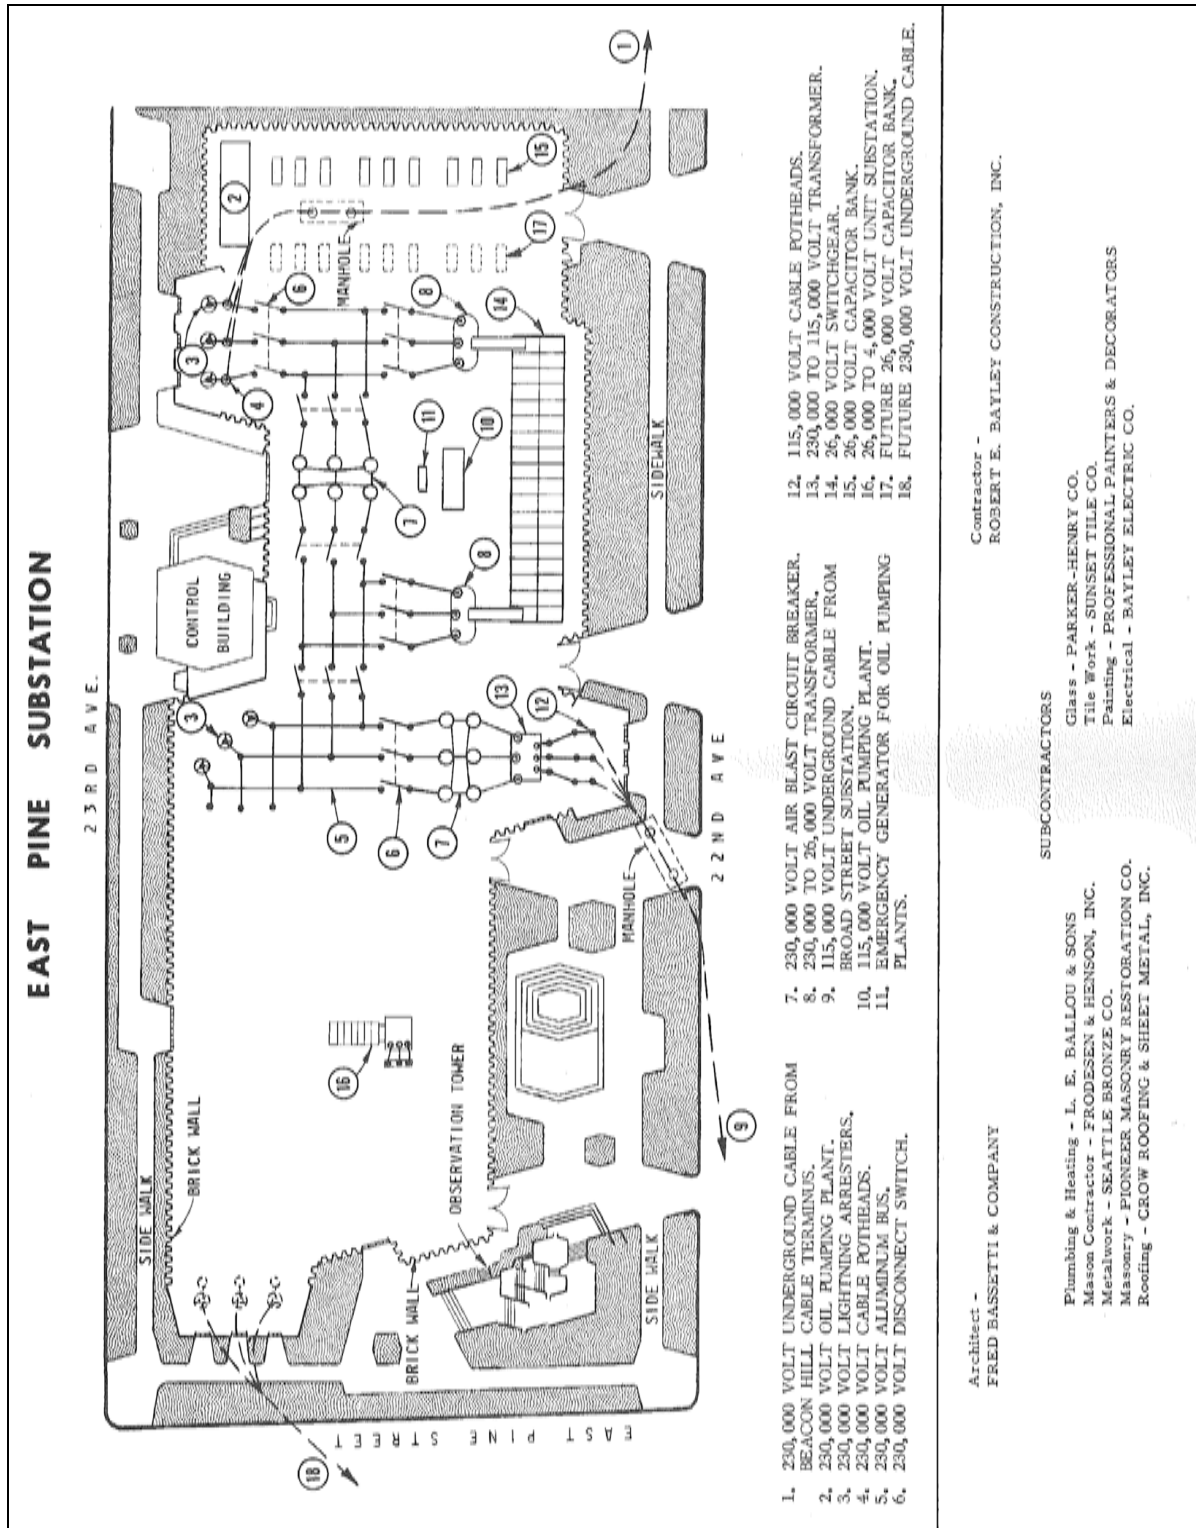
Above, the back page of the brochure for the open house in mid-1967. On the plan, north is oriented to the left. The plan shows the original north and west walls, viewing tower and play area.
